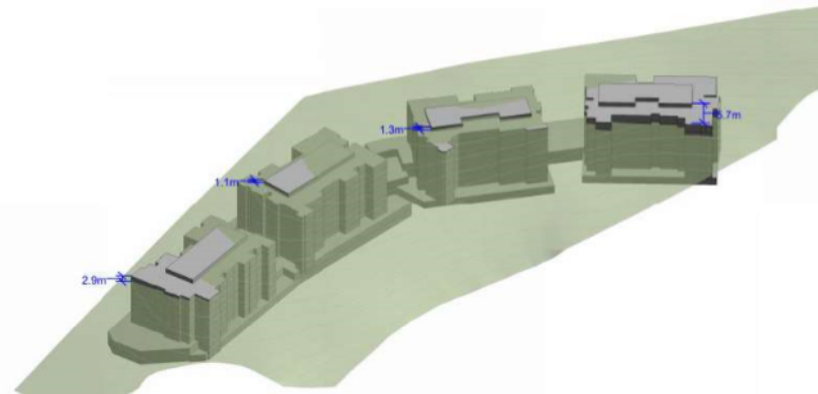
Proposed building heights, as measured from site levels pre-existing IBM development (Source: Mirvac Design)
